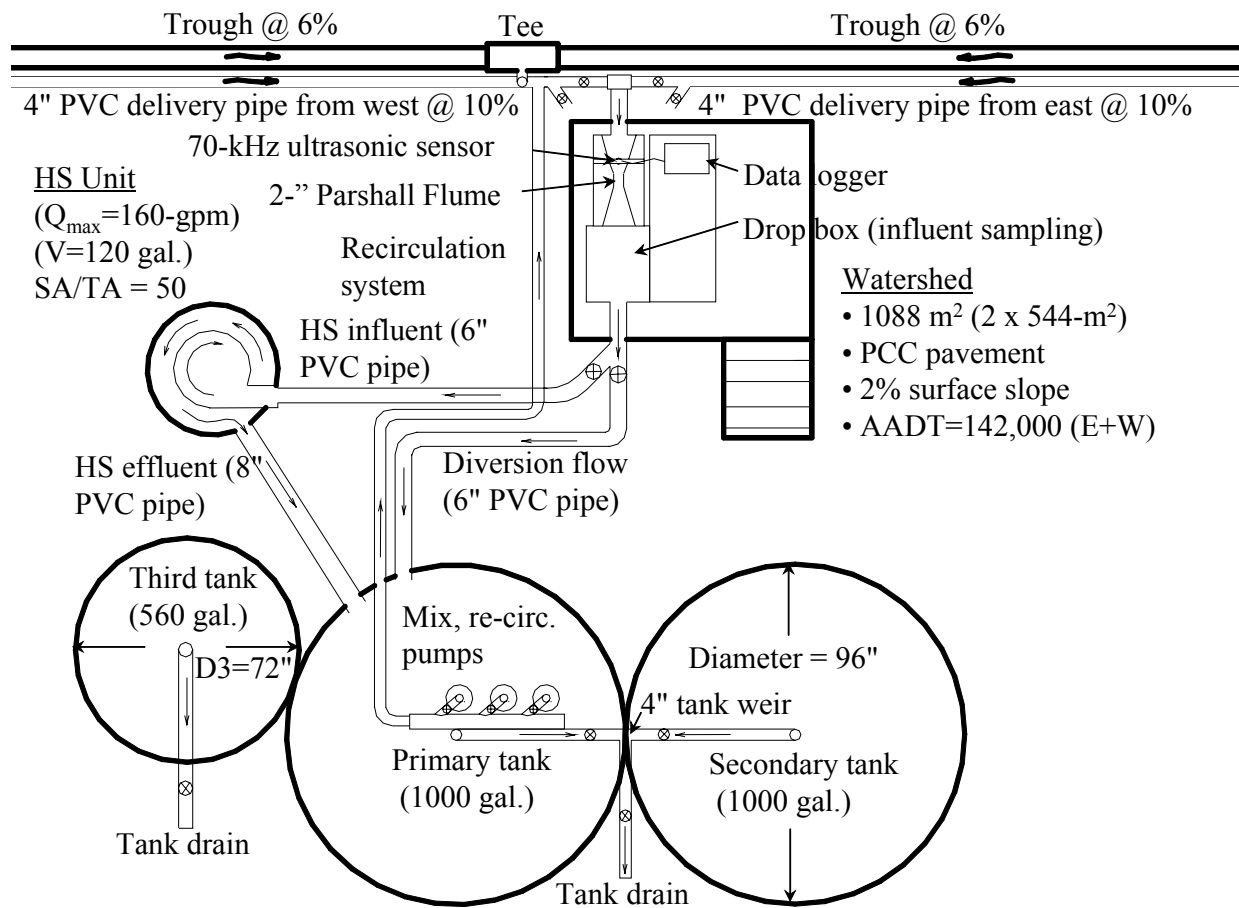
Plan view of Baton Rouge rainfall-runoff Catchment Site.
